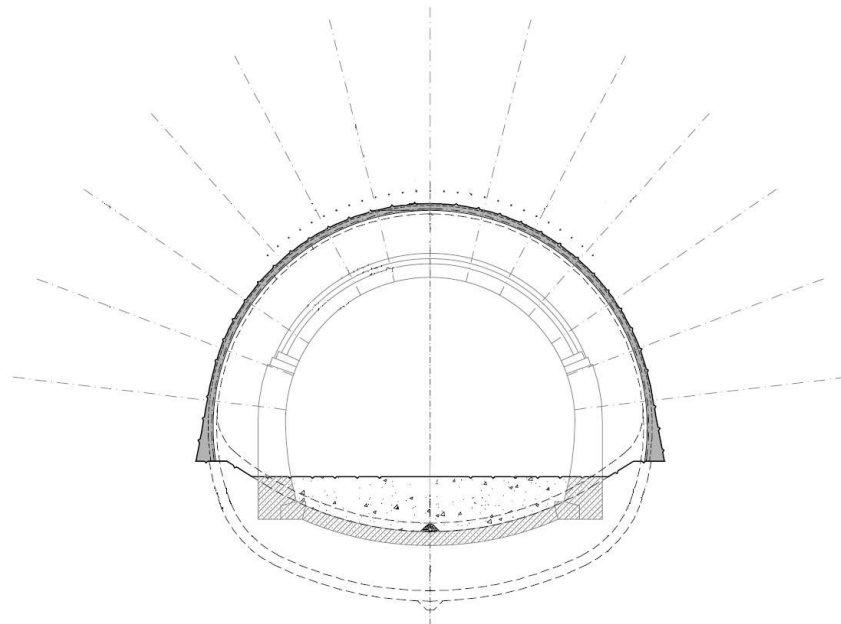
, temporarily invert construction (source Beton- und Monierbau)
